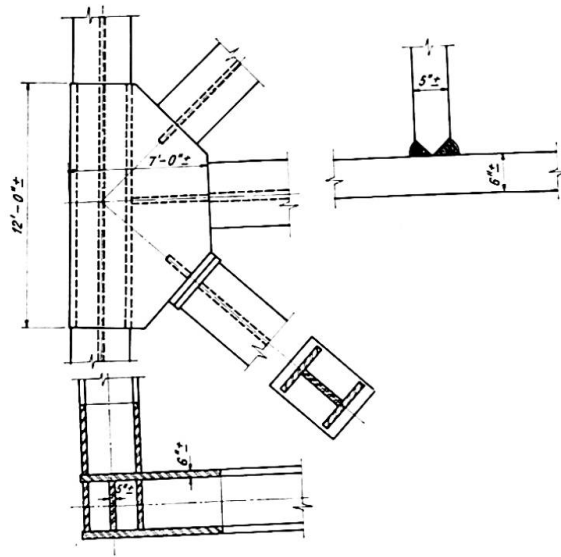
Schematic Joint Detail for Optimum Truss Type Structures
